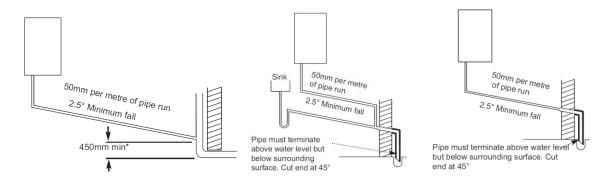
Connection to an internal soil-vent pipe, external termination with sink, to drain or gully
